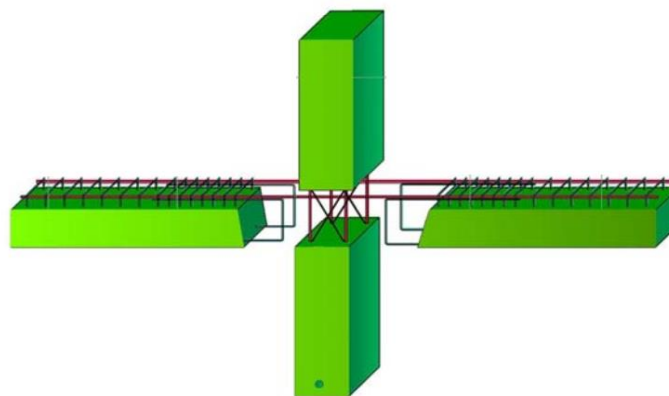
Precast specimen with corbel and stiffener using steel cleats
